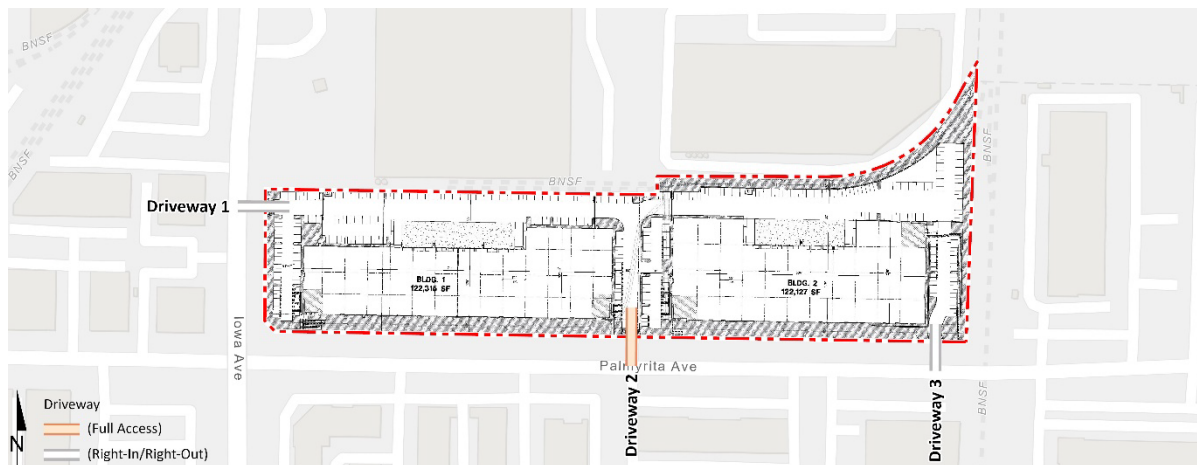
PRELIMINARY SITE PLAN (SCENARIO 2)
